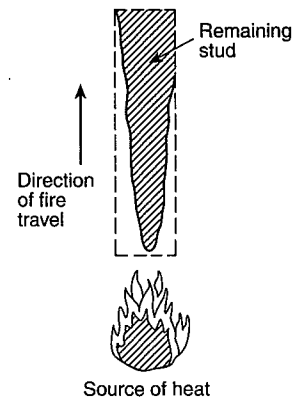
Cross Section of Wood Wall Stud Pointing Toward Fire.
